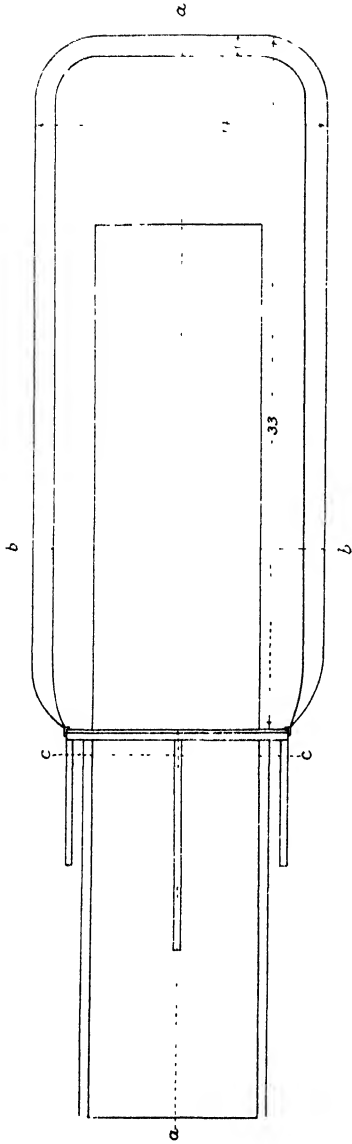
PLAN OF PIT TO HOLD 60-05 TONS OF SILAGE.
